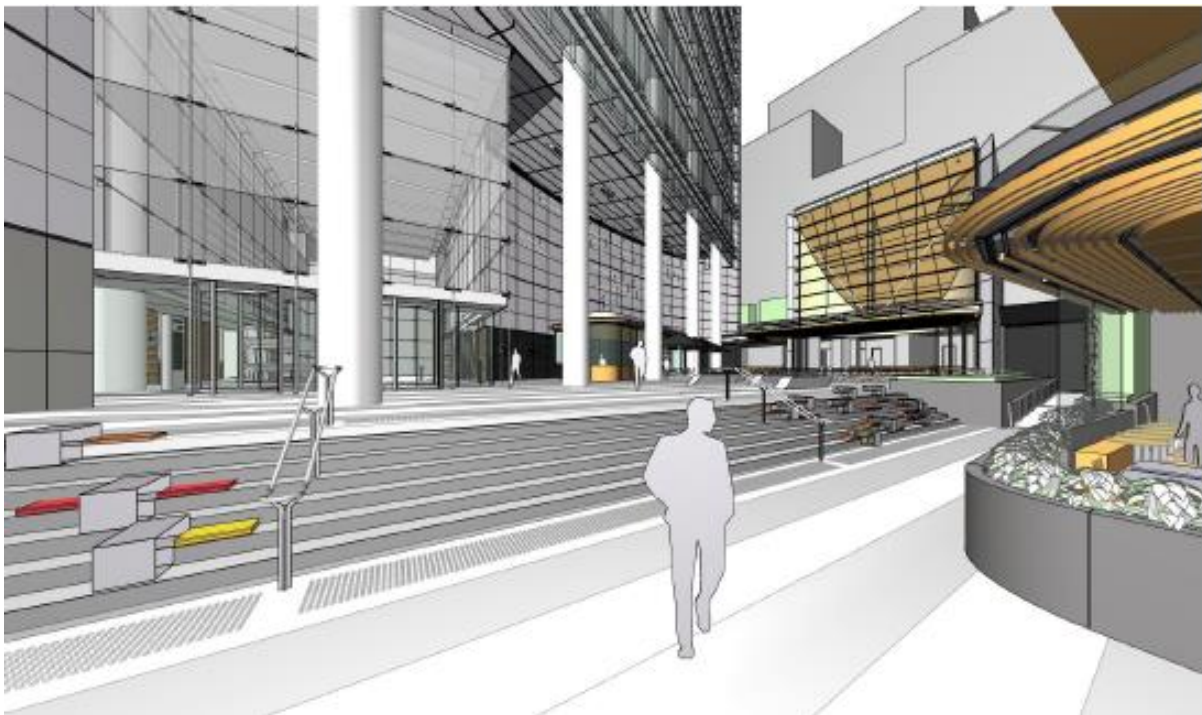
3D view on approach from the public right of way looking north to the plaza.
